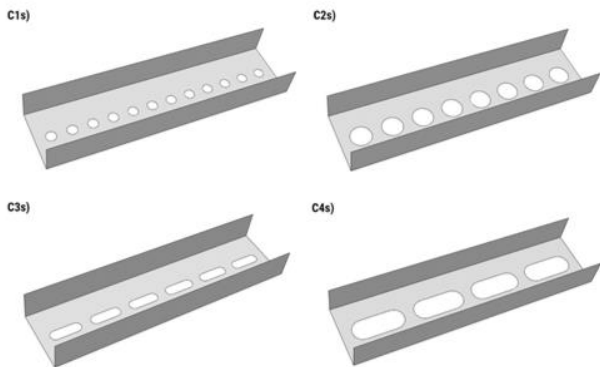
Models of C-section profiles in a variant of arrangement of holes on the web: (C1s) circular holes with a diameter of 10 mm, (C2s) circular holes with a diameter of 20 mm, (C3s) bean-shaped holes with a dimension of 30 mm × 10 mm ($R = 5$ mm), (C4s) bean-shaped holes with a dimension of 50 mm × 20 mm ($R = 10$ mm)
